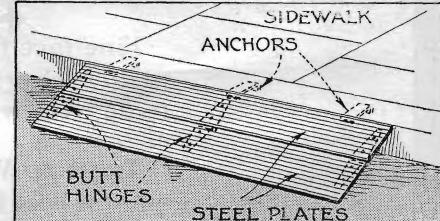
Steel plates fastened together make a folding runway to take your car over the curb that stands between garage and street.
